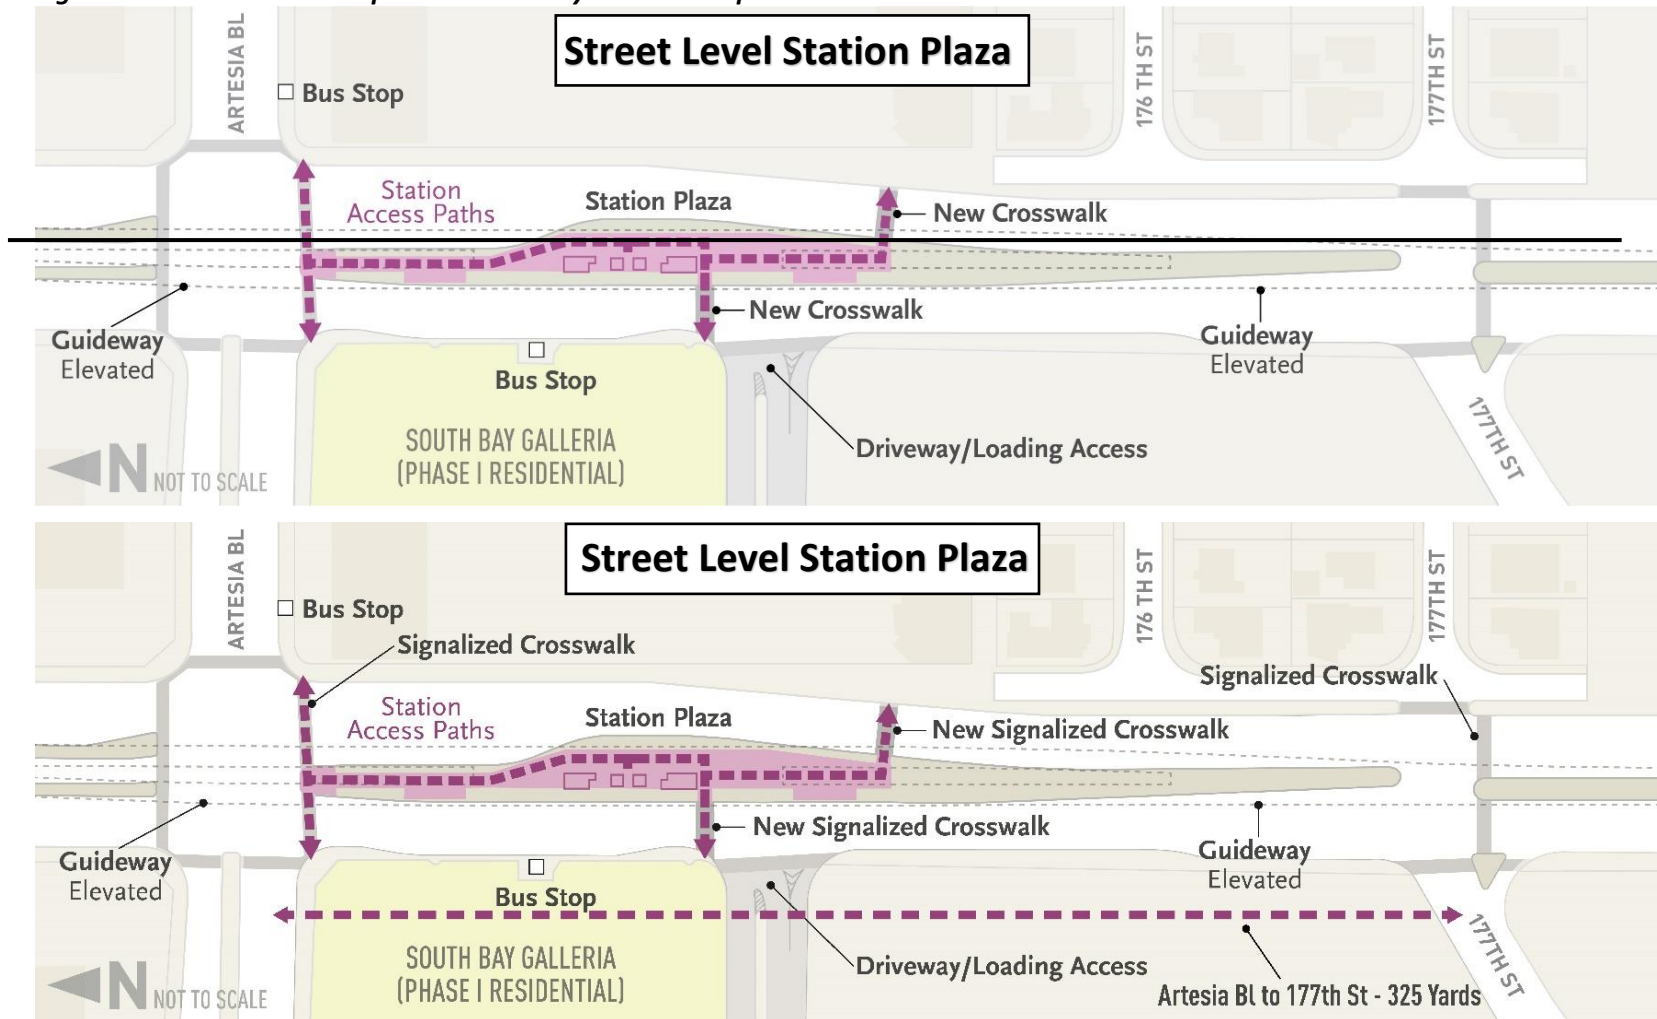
Proposed Project – Torrance TC Station Layout
